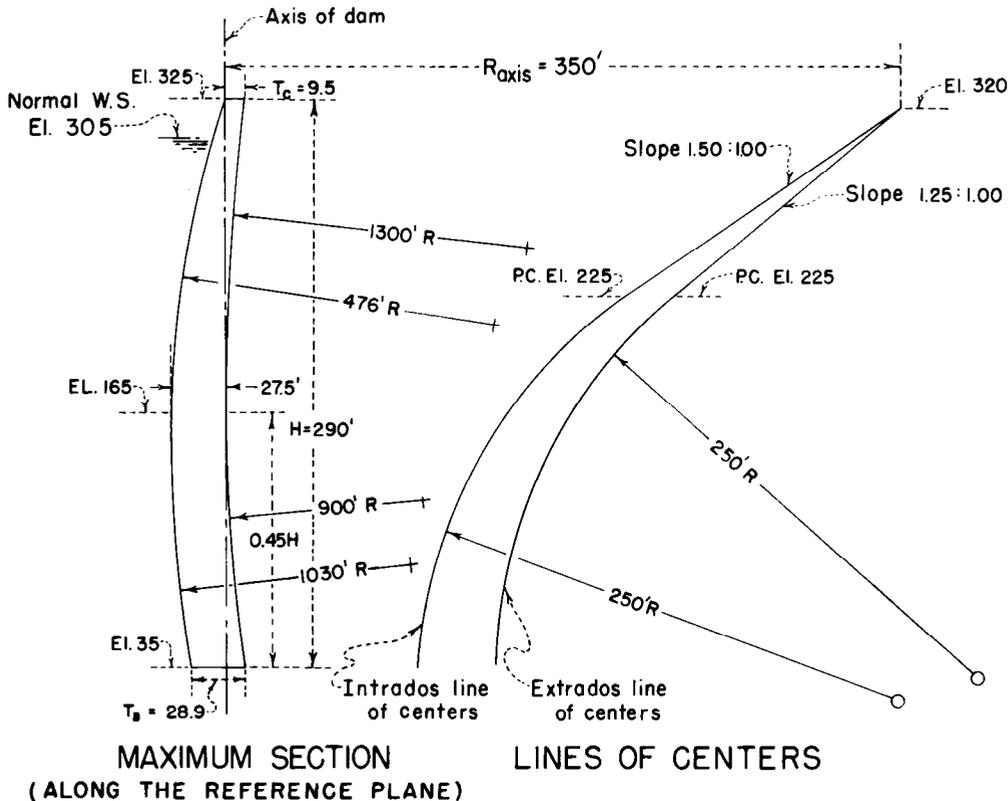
Crown cantilever and lines of centers for a preliminary design.—288-D-2961
